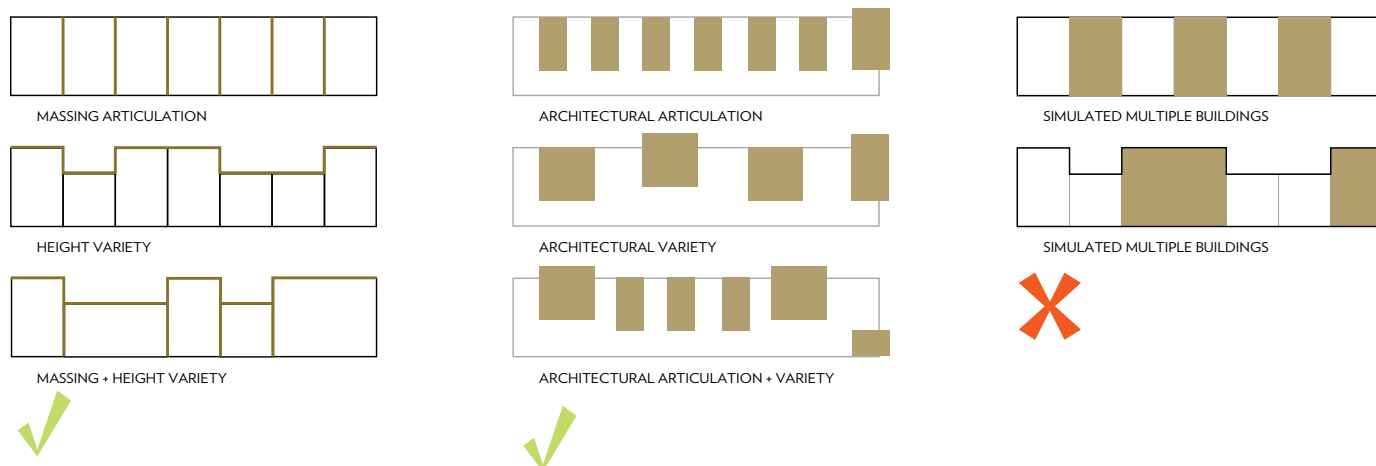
When one building typology is used for an entire block, modulate the building scale and vary the façade. However, single buildings that try to simulate multiple buildings are not recommended.
